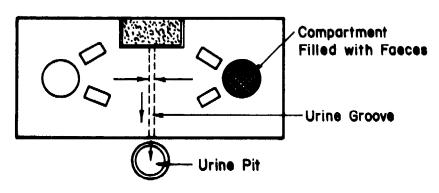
c Alternative Arrangement, Plan View of Double Septic Bin
